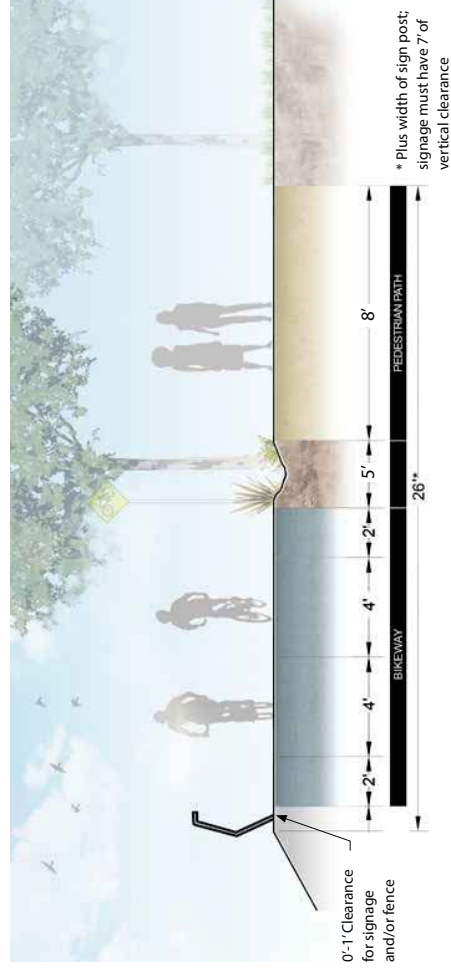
Reseda Boulevard to Etiwanda Avenue - Typical Cross Section
